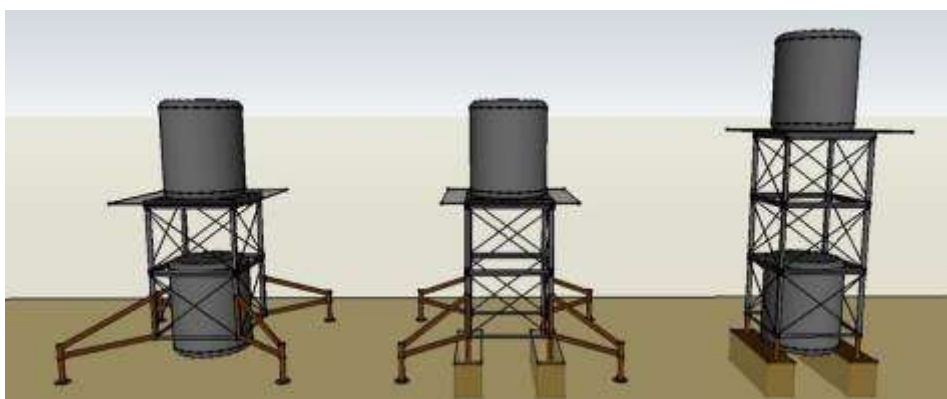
Sketches of a phased approach in the construction of the tower and its foundation.
